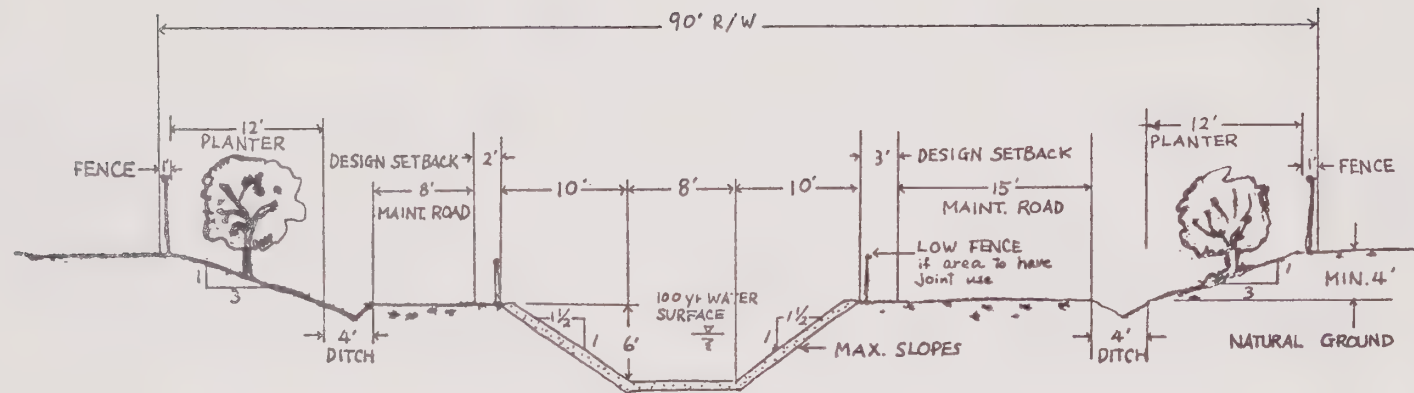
TYPICAL SECTION FOR CONCRETE-LINED CHANNEL WITH 4-FOOT ROAD
